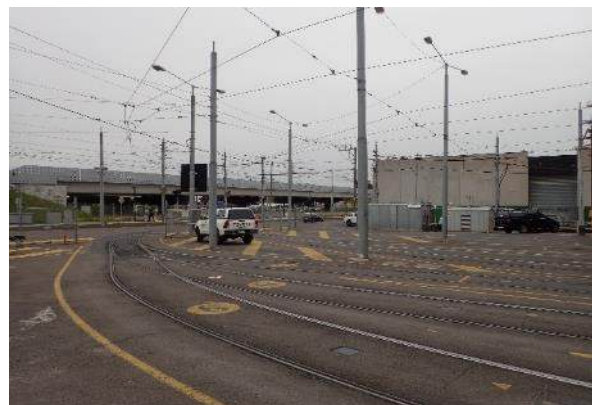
Roads 2 to 9 and associated track fans near Cameron Street, facing north
